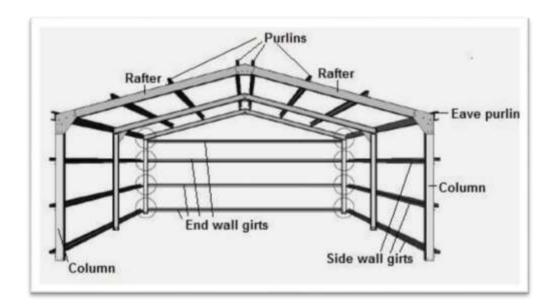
Typical portal frame structure. Source: Steelconstruction.info, (2020)
